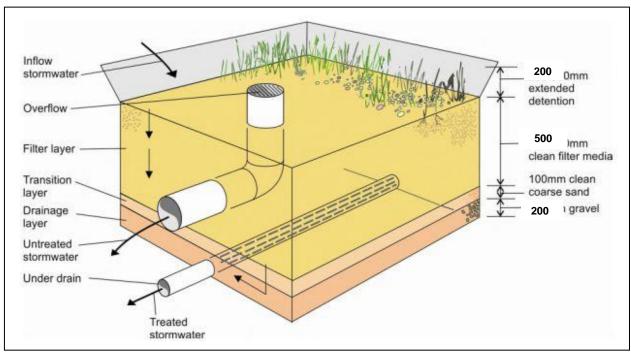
Typical Section Bioretention Basin (FAWB 2015)
